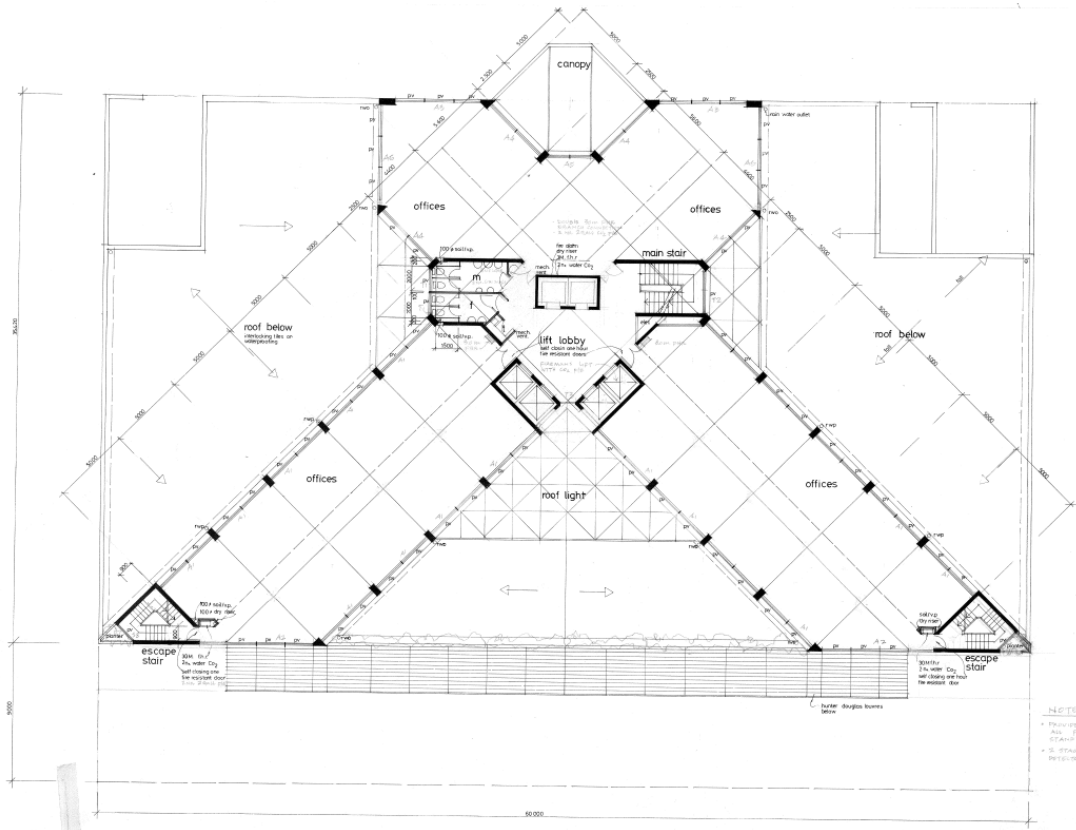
4 Floor plan of View Park Towers drafted in the late 1980s. Source: Harbans Singh Associates
